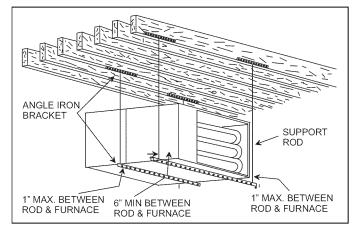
Typical Suspended Furnace / Crawl Space Installation
